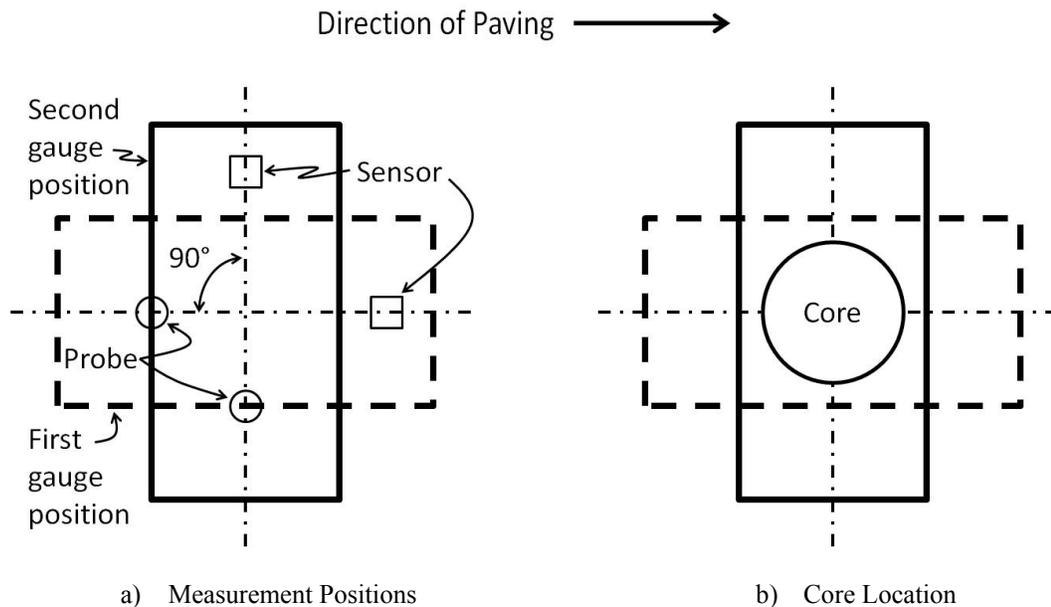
Measurement Positions and Core Location for the 'Cross-shaped' Footprint
